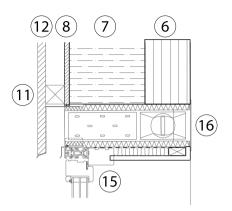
Detail 1:10 vertical section - Inventilate integrated above window
